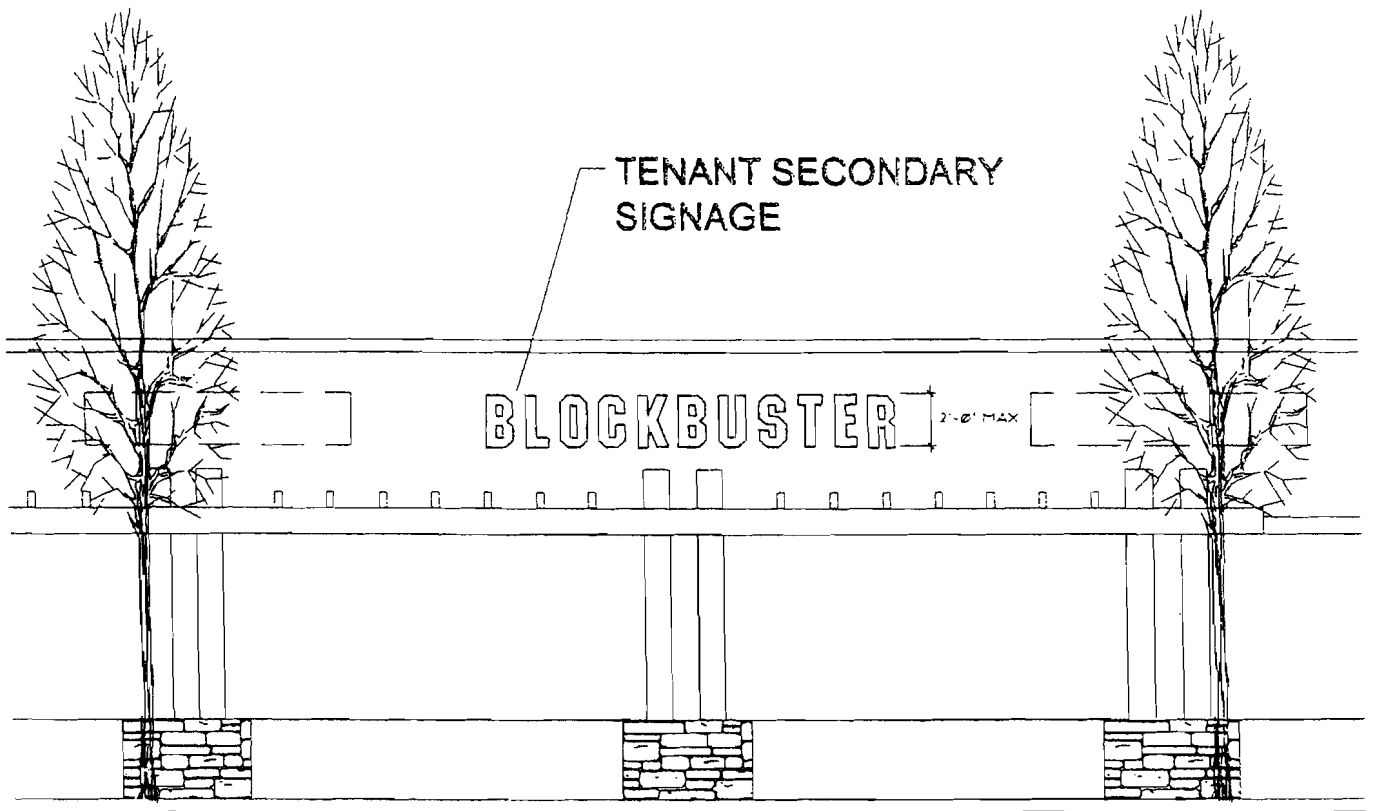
EXHIBIT 'C' - MAJOR ANCHOR SIGNS
